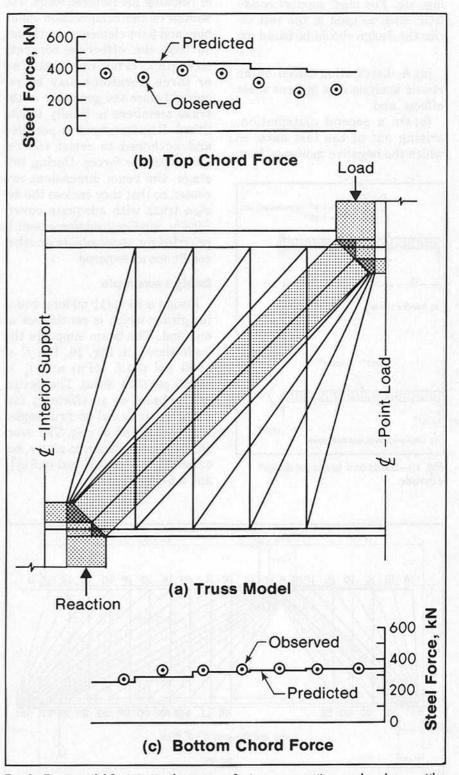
Truss model for interior shear span of a two-span continuous deep beam with light web reinforcement.
